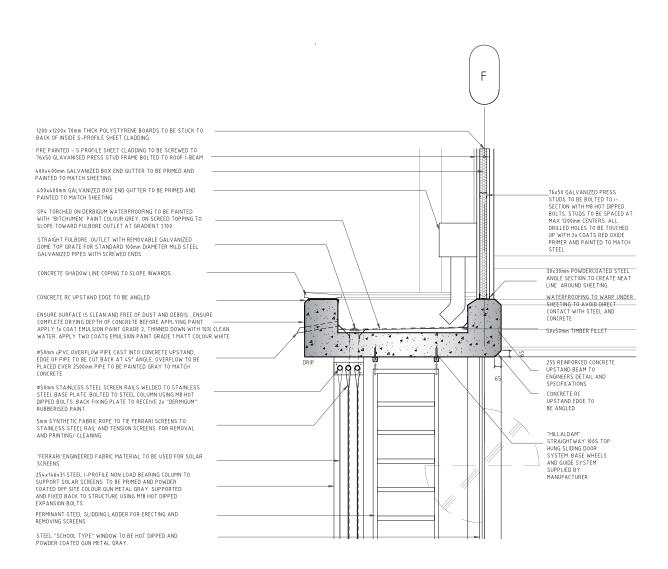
DETAIL C - PLANTER BOX DETAIL SCALE N.T.S
